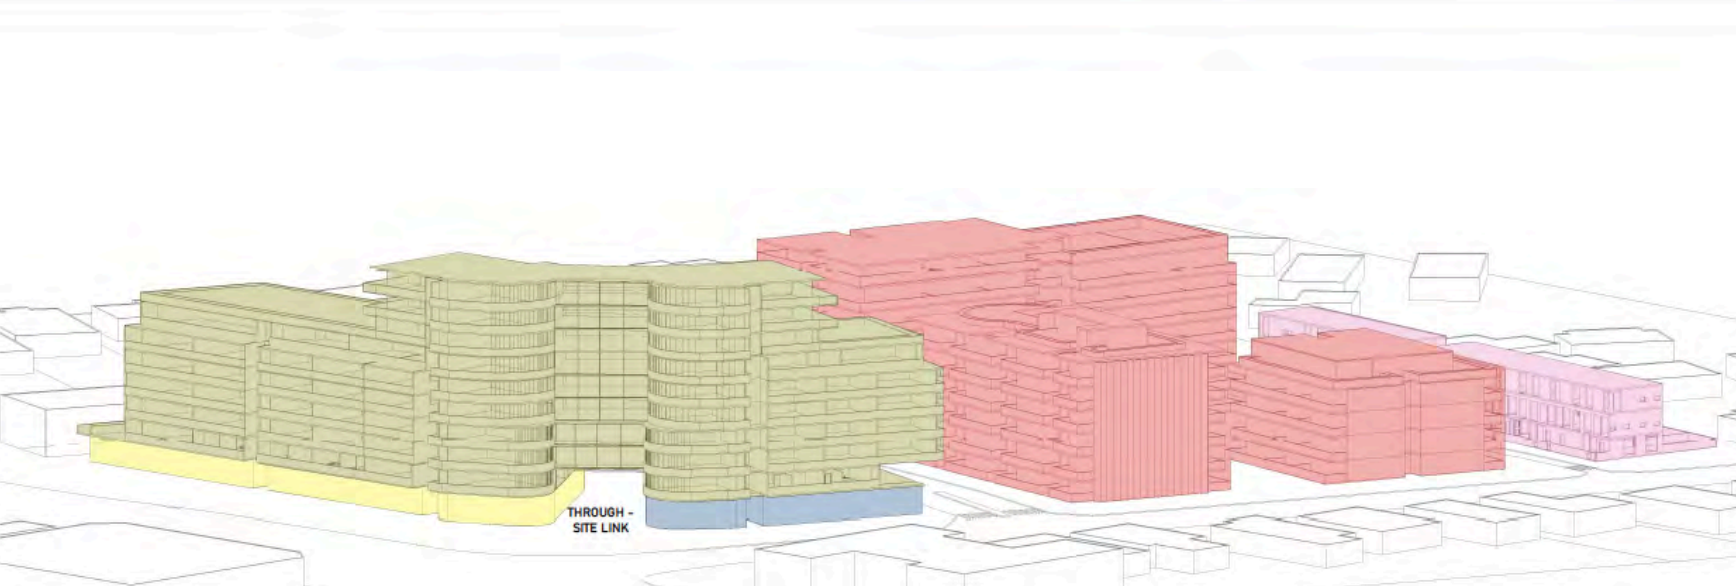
Proposed Conceptual Built Form – Aerial View Northwest
